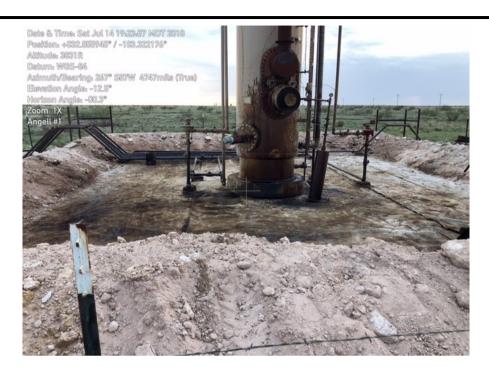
View of the secondary containment, liner after integrity inspection, looking west
